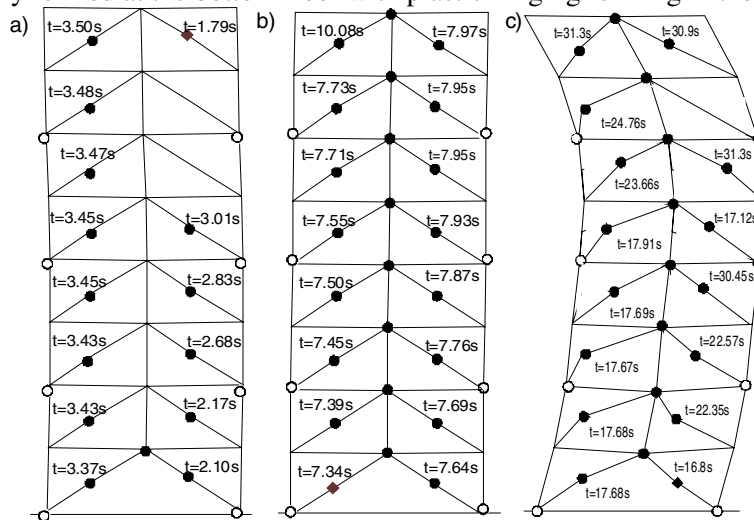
Sequence of brace buckling and beam hinging for the 8-storey building under:
